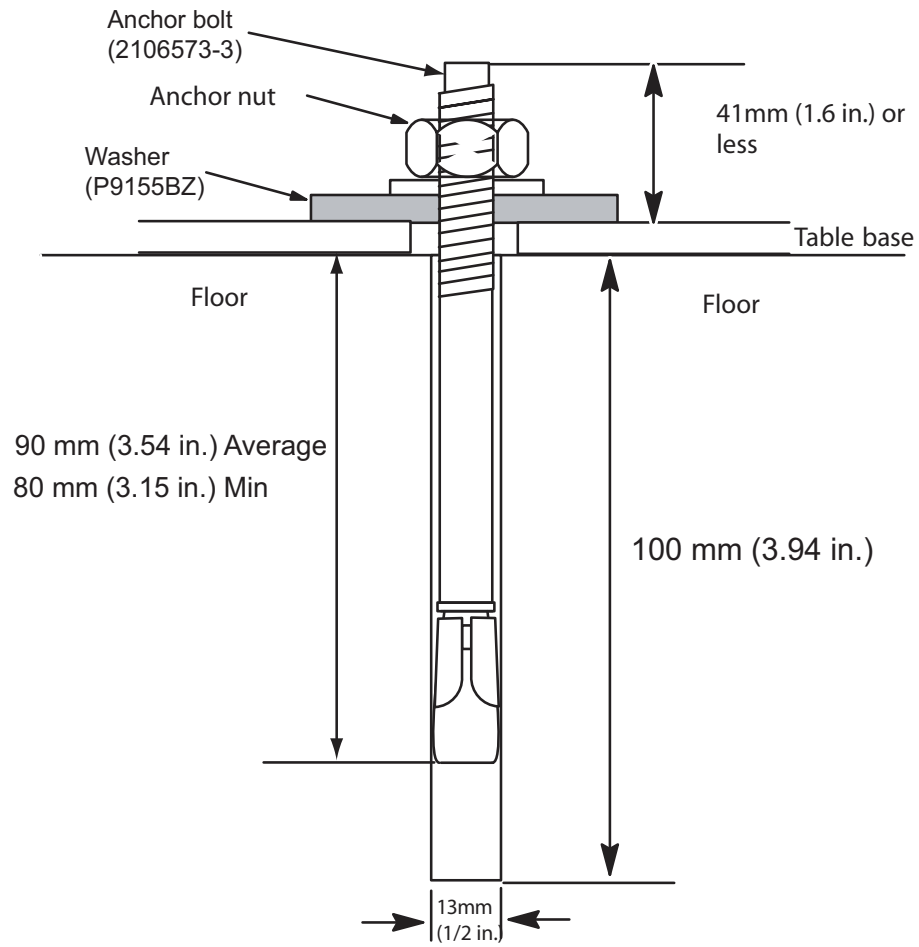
Lite Table Anchoring with 2106573-3 Anchor Bolt
